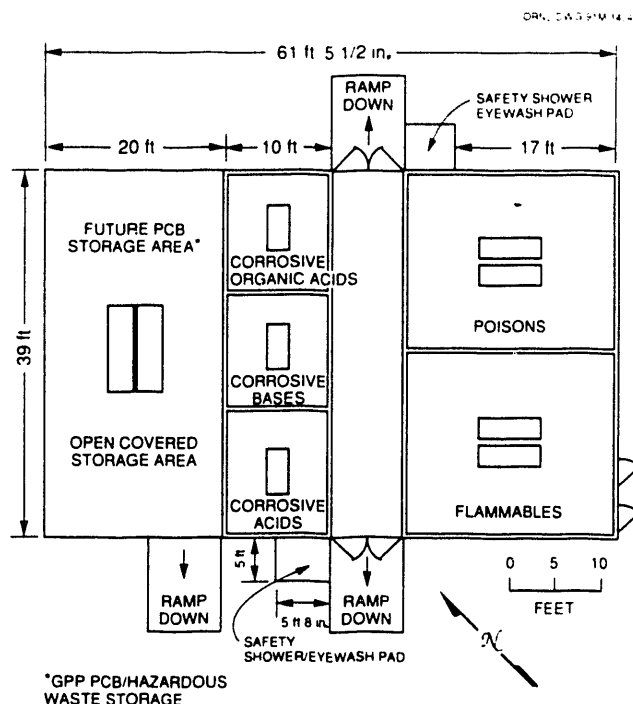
Layout of the Hazardous Waste Storage Facility (Building 7652).
